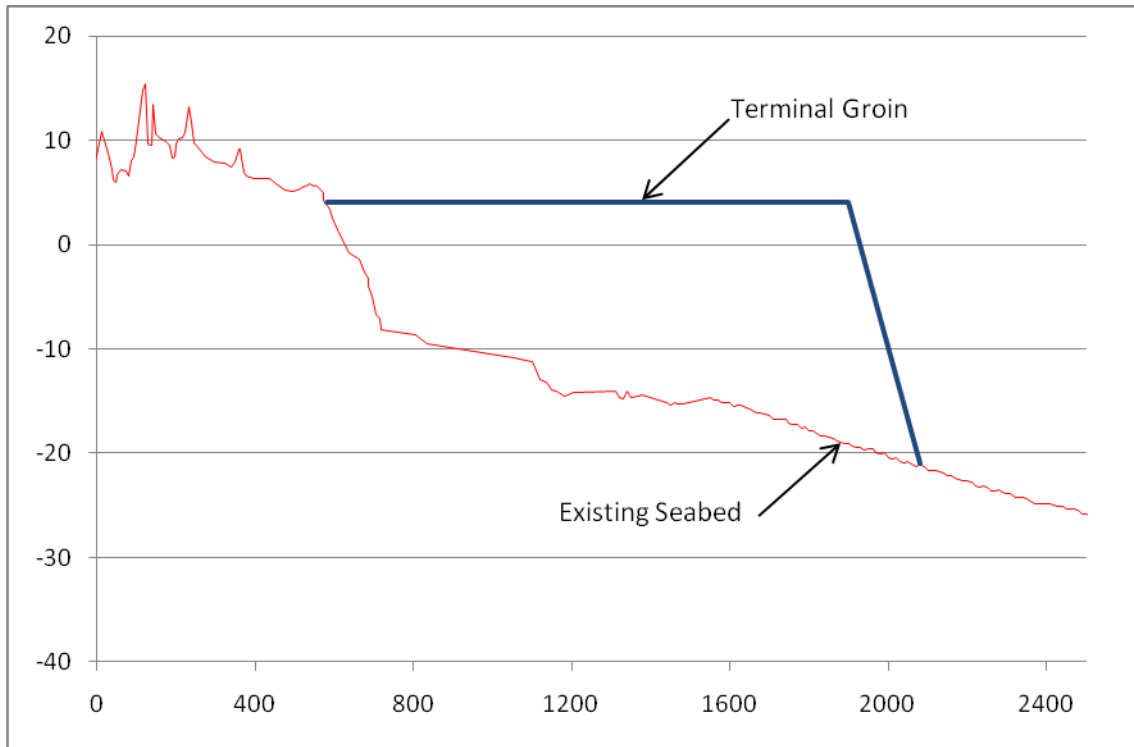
Groin Cross Section on a Steep-Sloped Beach
